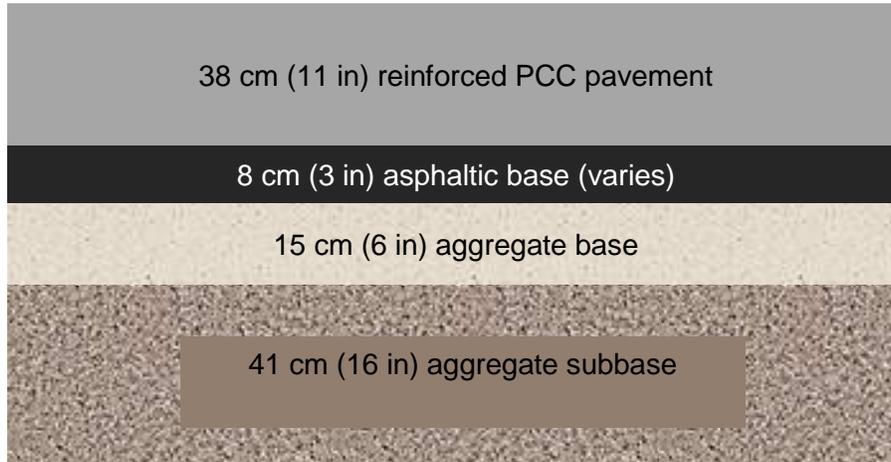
Schematic of reconstruction pavement structure (Strand Associates, 2014)
